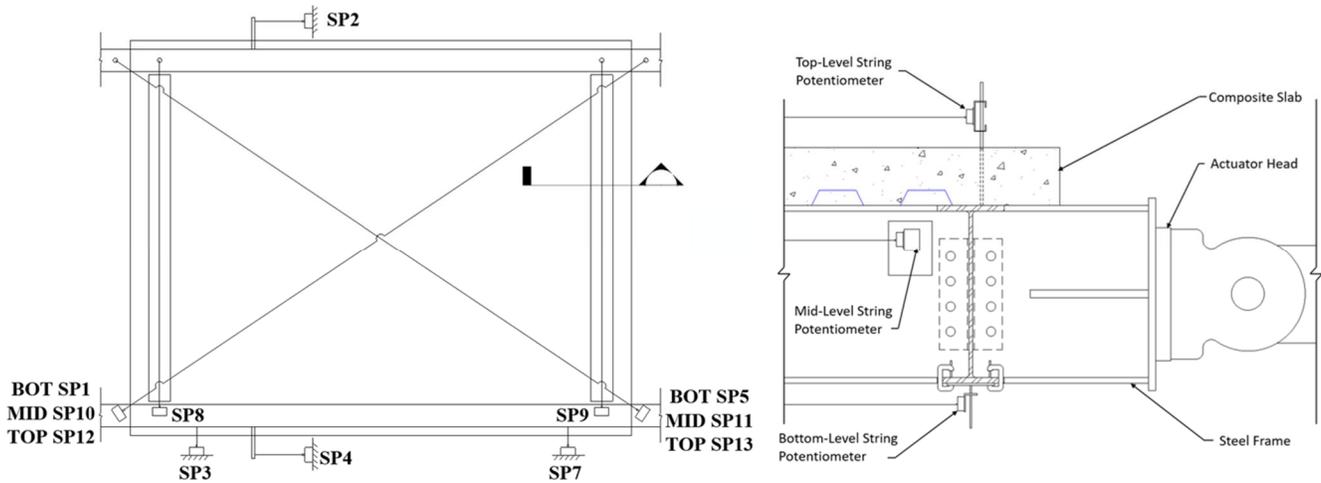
Instrumentation Setup for Cantilever Diaphragm Tests (a) Plan view. (b) Section.
